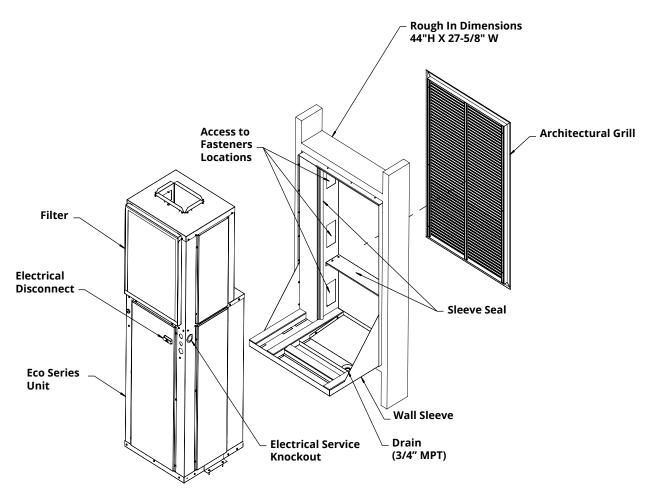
B - General Assembly for Large Sleeve and Grill for 09-18 sizes with block off
